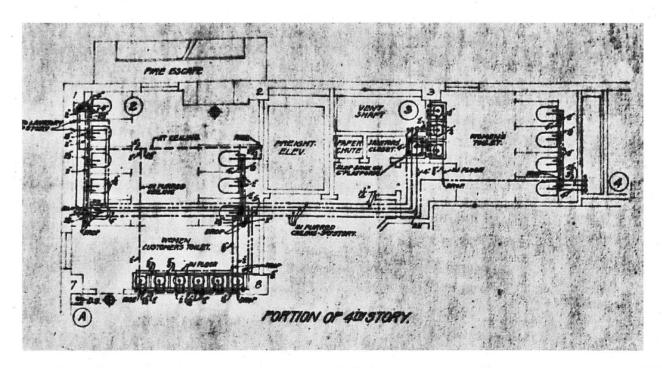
Special women's rest room area and general toilets on north end of fourth story of Parker building, Graham, Anderson, Probst, and White (Putnam Trust collection, unprocessed drawings).
